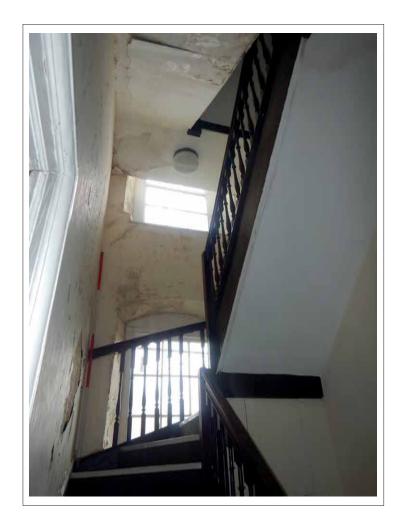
Room 0.4, the secondary stairwell, looking east. 2m scale.
